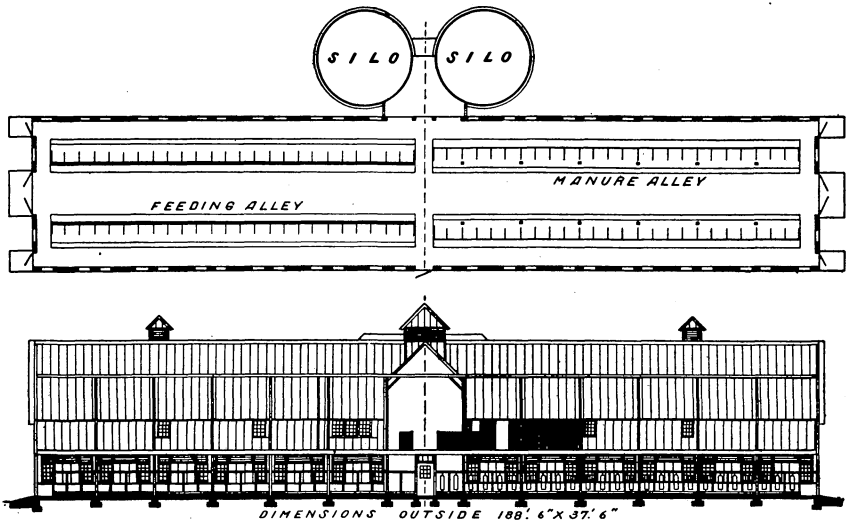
Floor plan and longitudinal section of two-story stable for 100 cows.
